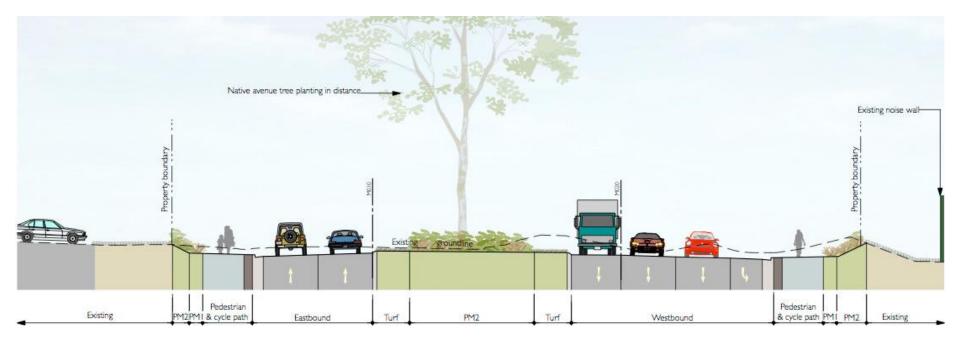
Typical cross section west of the intersection of Memorial Avenue with Free Settlers Drive and Arnold Avenue (West)
